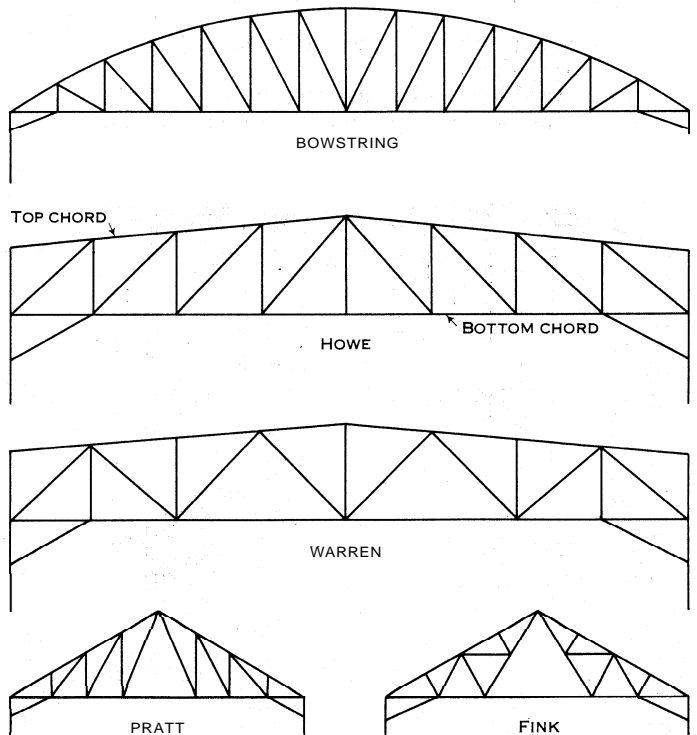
TYPES OF MODERN ROOF TRUSSES
